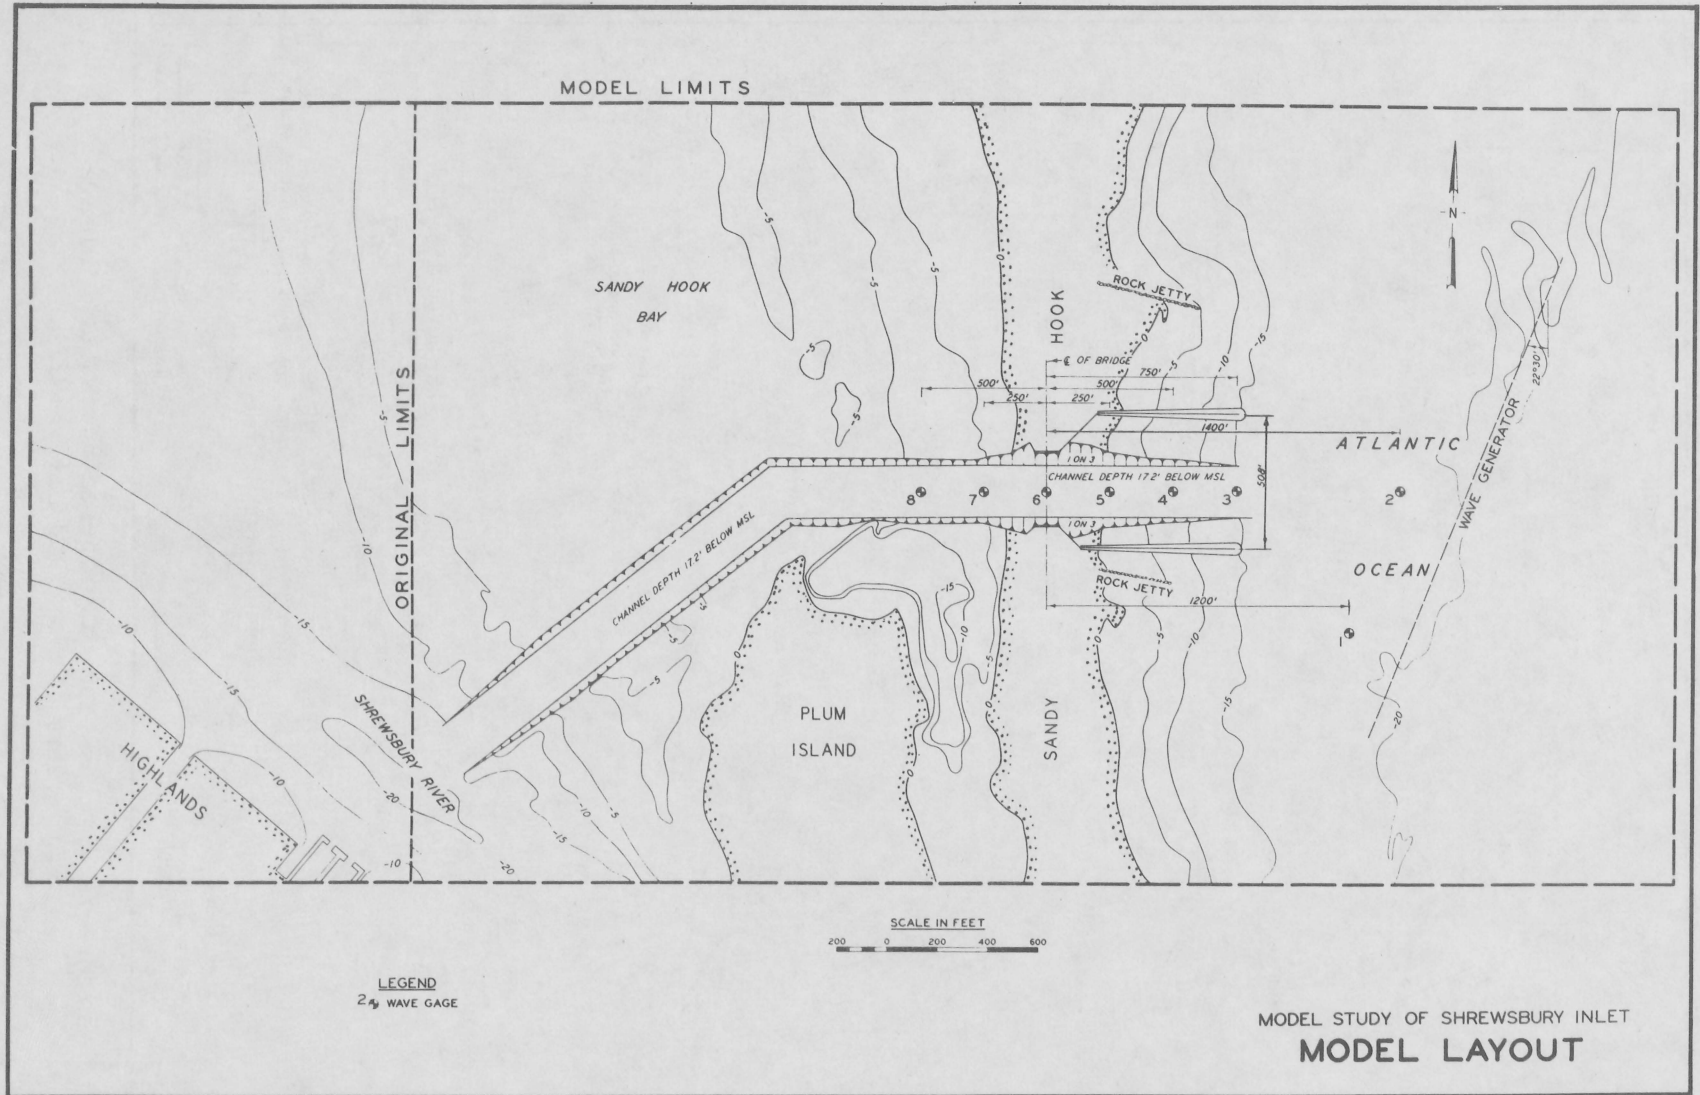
Undistorted-scale model of Shrewsbury Inlet (after McNair and Hill, 1972).
